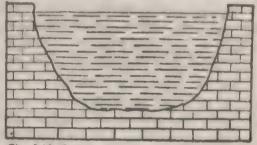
Section of a dam to show that the walls are wider at the bottom.
